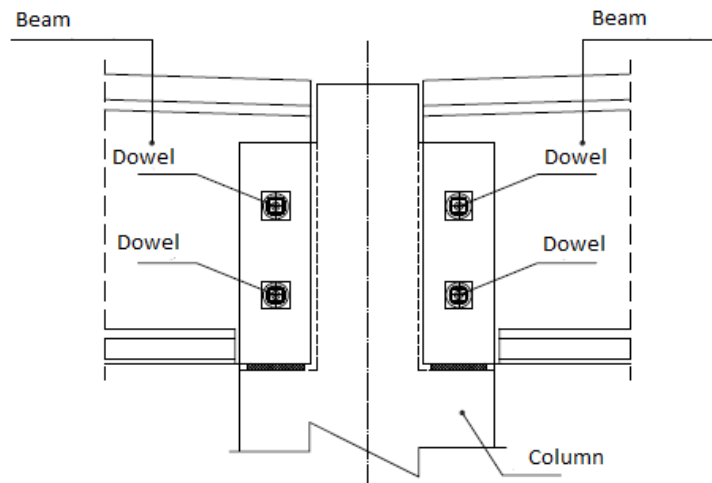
Beam-column connection used in Romania for precast industrial buildings.
